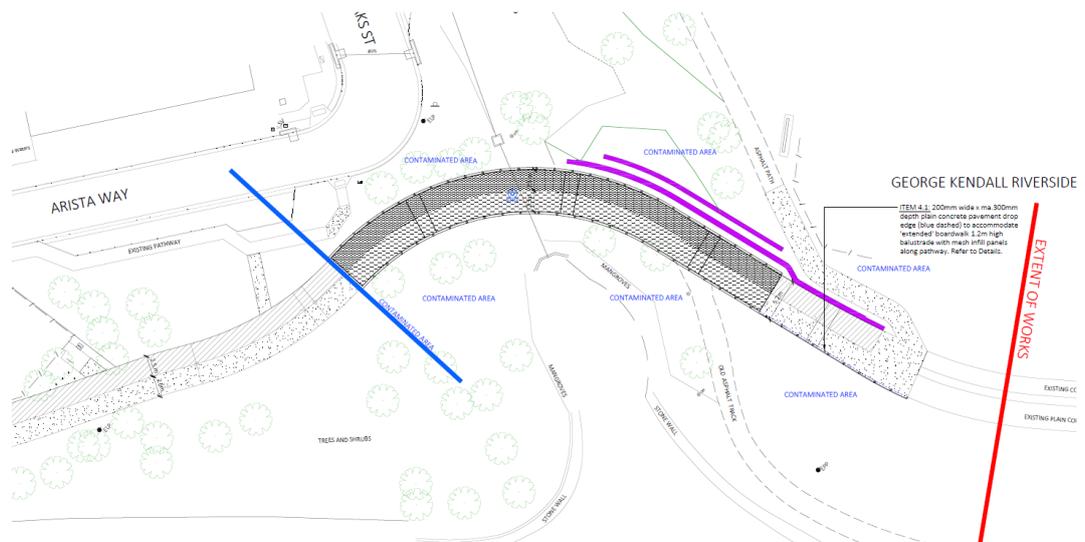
Proposed Hardworks, Boardwalks and Bridges Plan 5. Source: City of Parramatta
